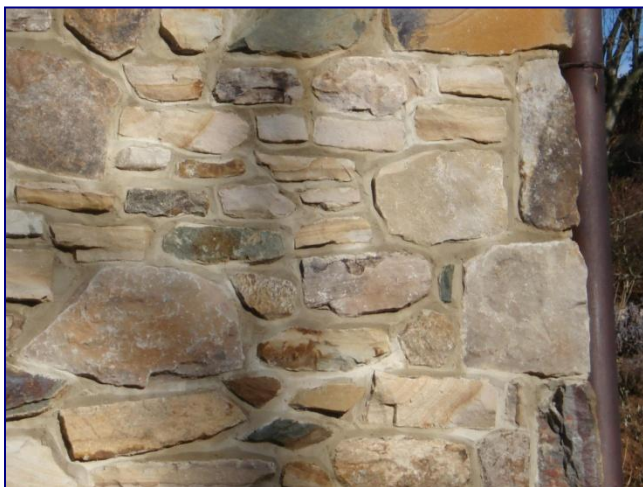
Example of proposed mortar at the Pink House addition at 40174 Main Street in Waterford.
